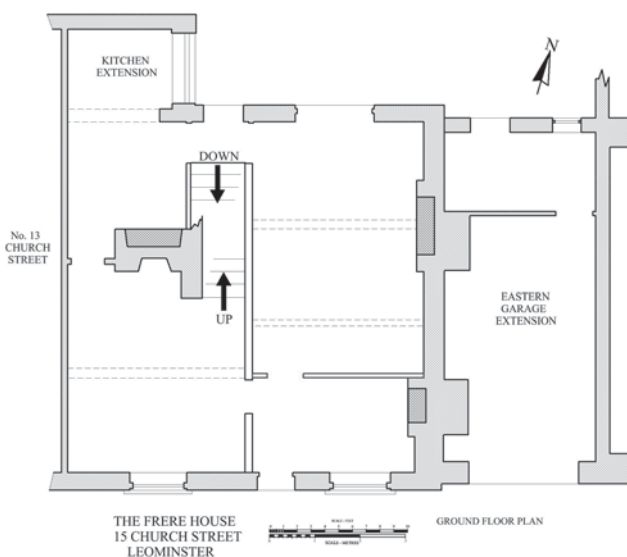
15 Church Street, Leominster, ground plan showing the central north-south partition.
